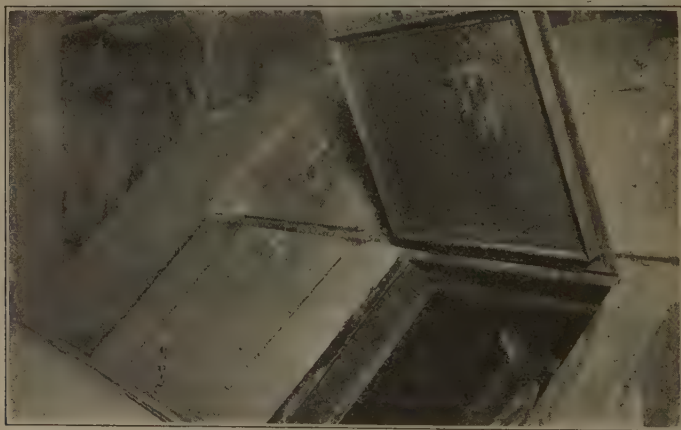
CONCRETE RAISE COVER WITH ONE DOOR OPEN.
